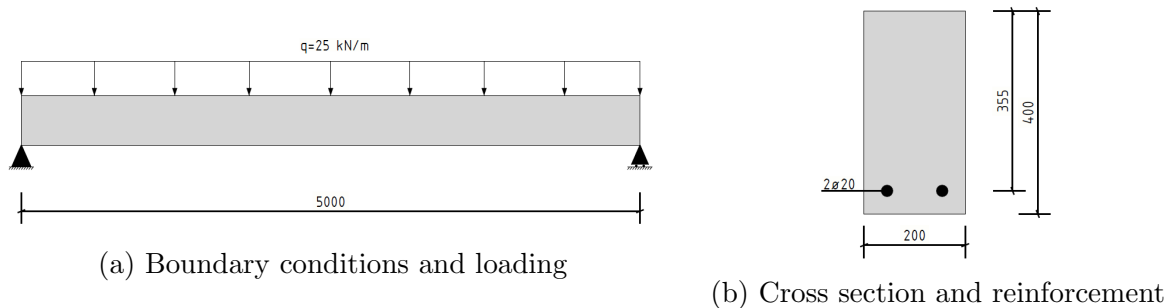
Beam used for crack-width calculations (dimensions in mm)
